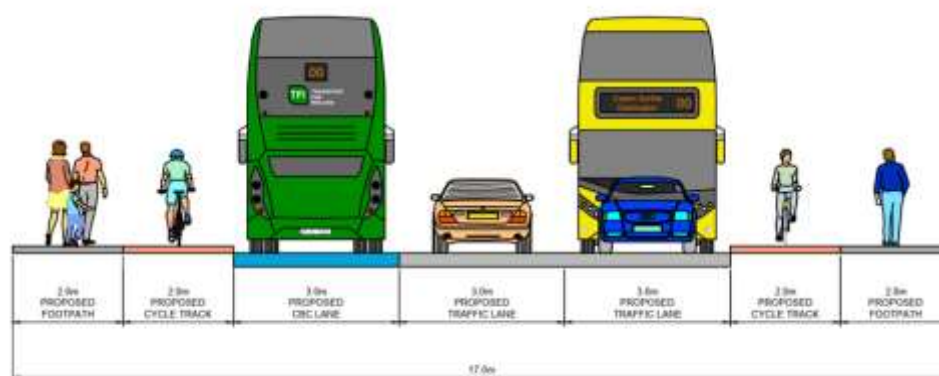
Typical Traffic Management Cross Section (A – A)
